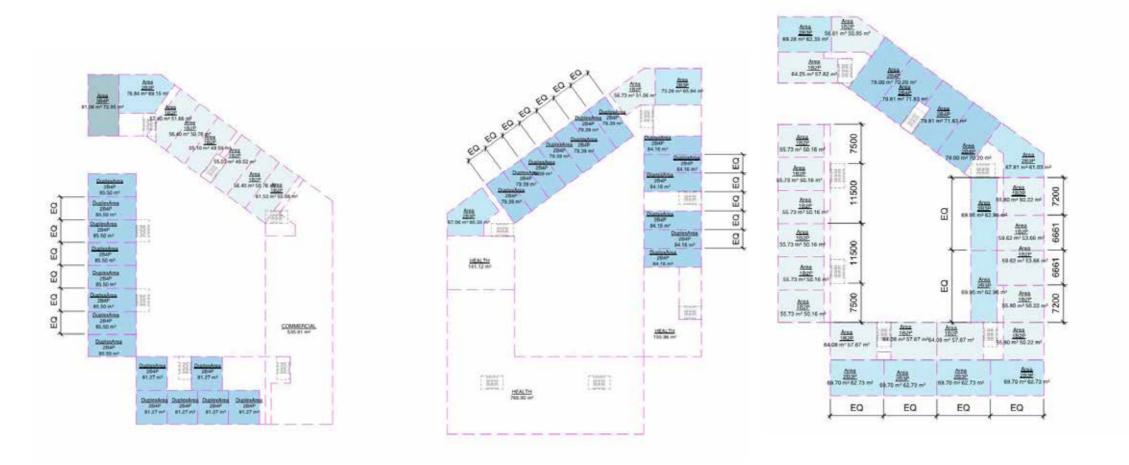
Initial working showing Glencoyne Square ground floor plan
